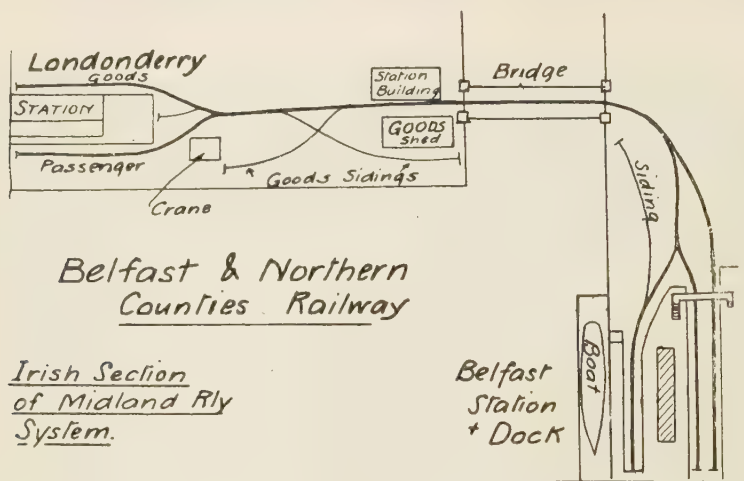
PLAN OF BELFAST AND NORTH COUNTRIES SECTION.
